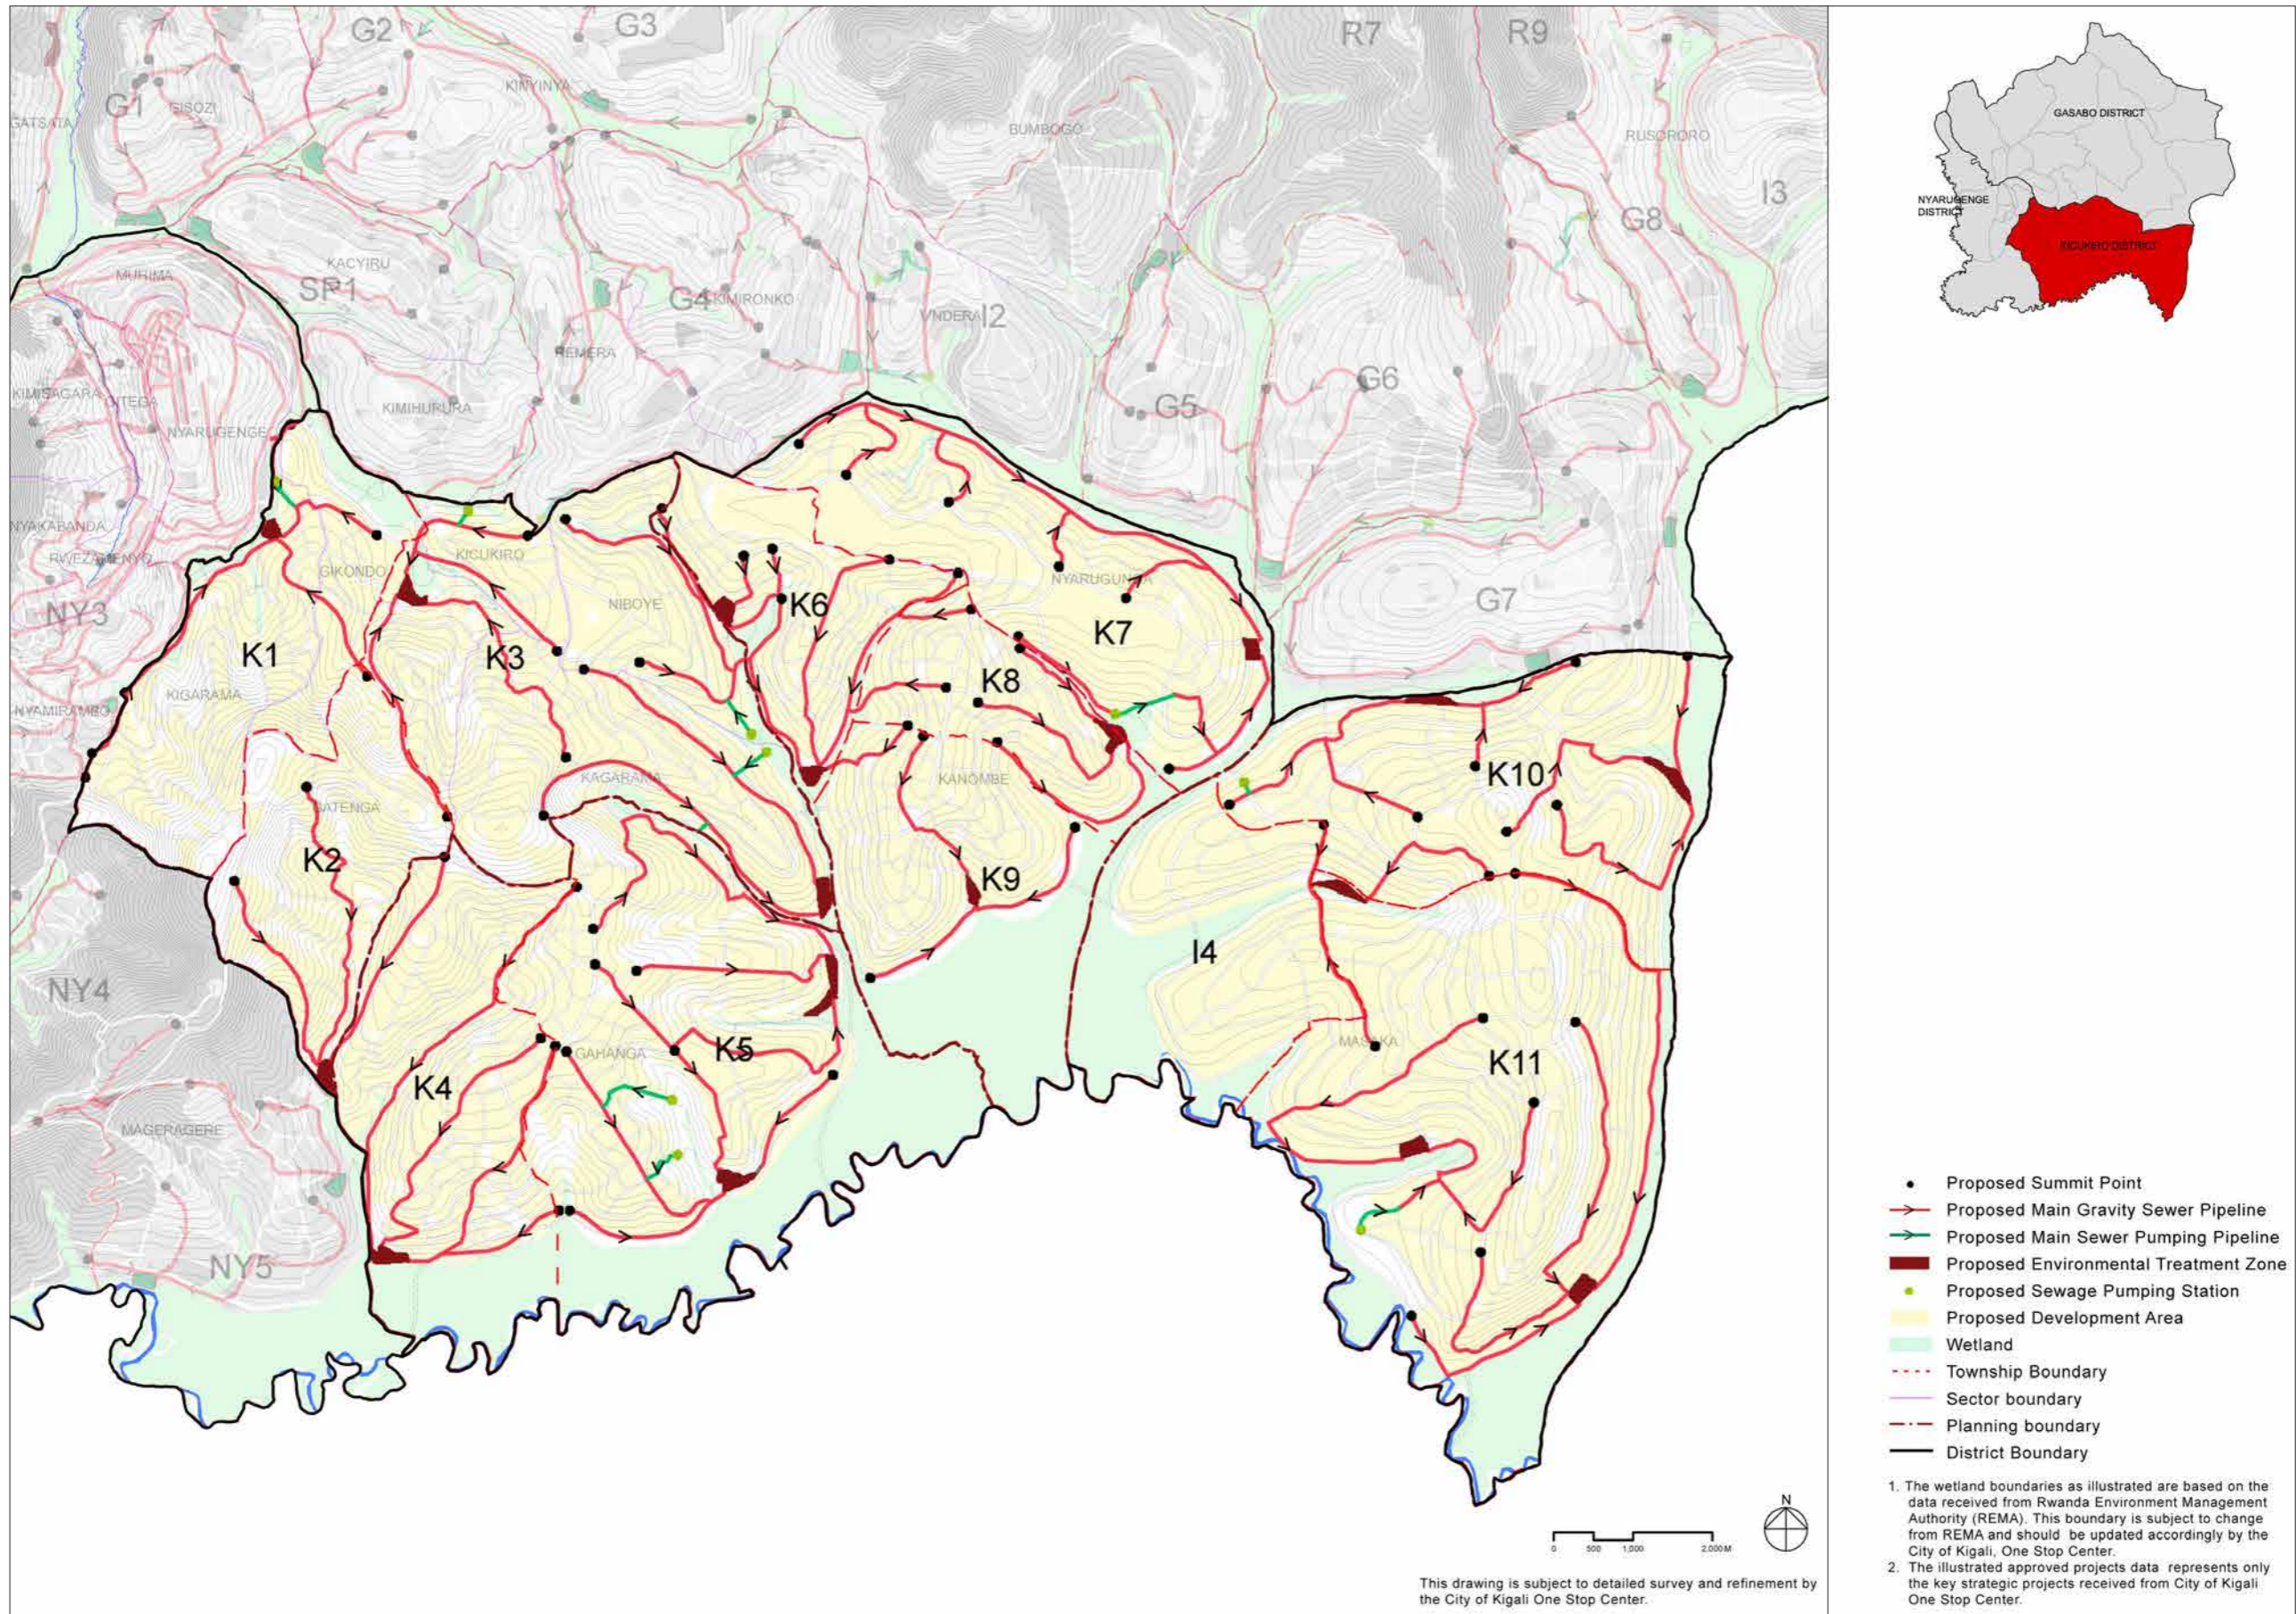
Kicukiro District - Proposed Sewerage Plan - Year X
